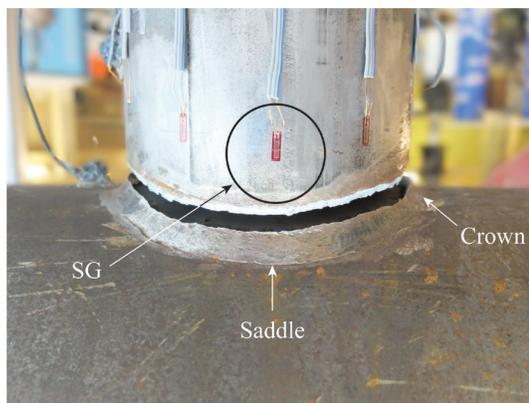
Weld fracture in a 90° cross-connection.
